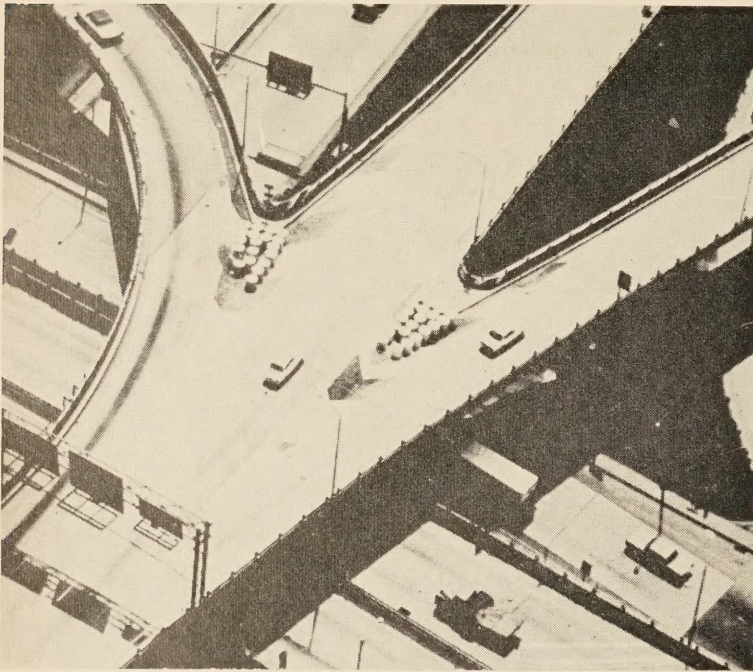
Two Fitch Inertial barriers installed on an existing elevated structure.
